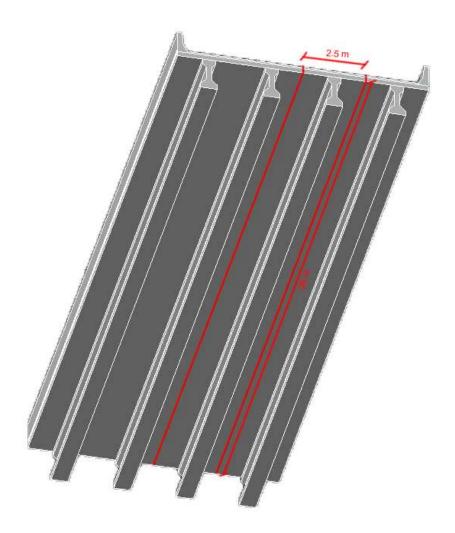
3D view of interior girder designed (girder between red longitudinal lines)
